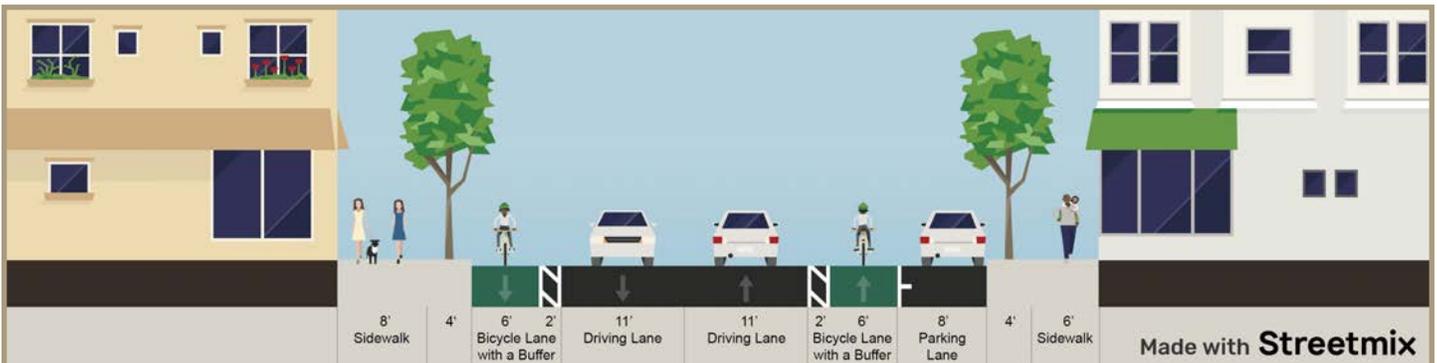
Looking north on Main Street - Proposed Design (Alternative II).
